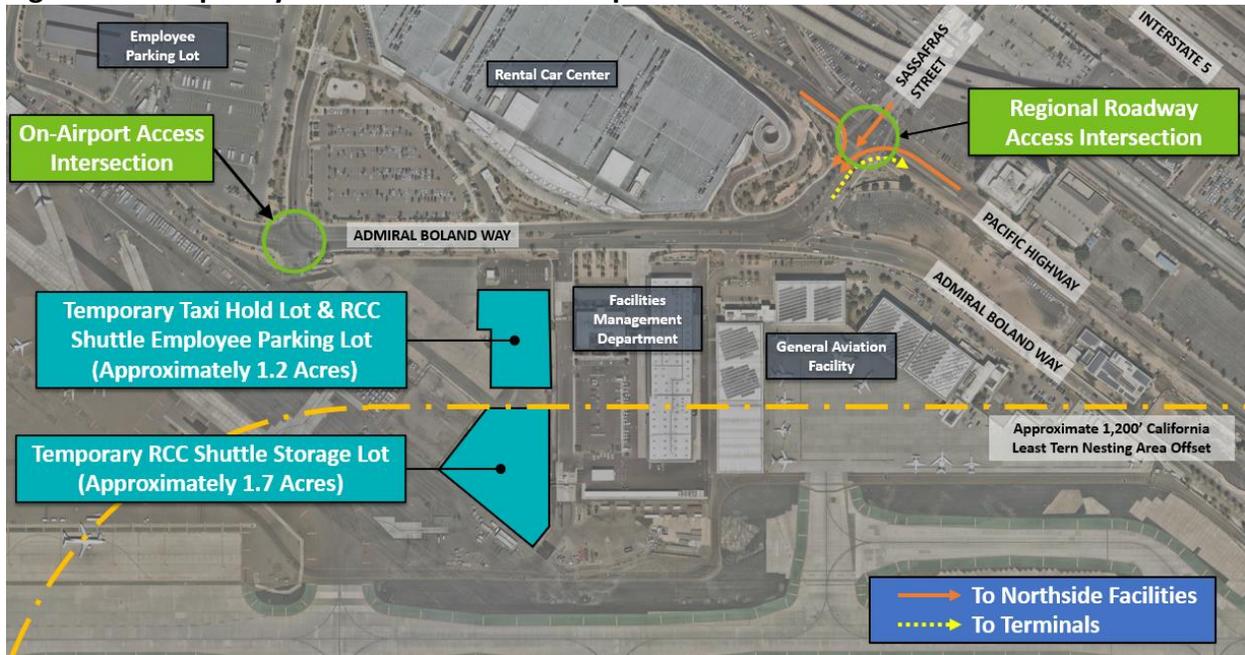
Temporary Northside Ground Transportation Facilities Site Plan Concept
